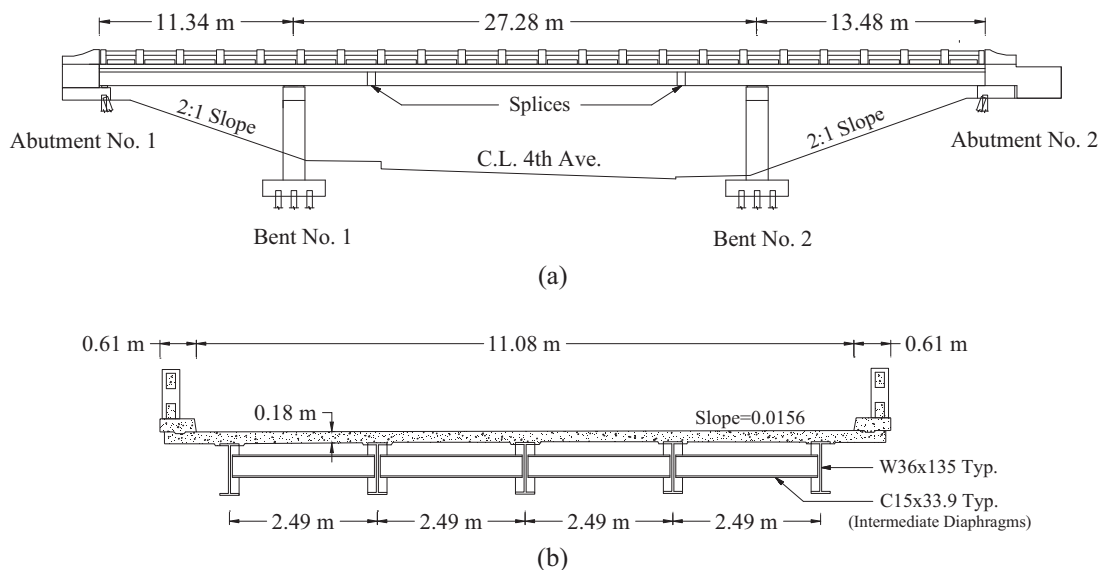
I-40 westbound bridge over 4th Avenue: (a) longitudinal profile; (b) cross section.
